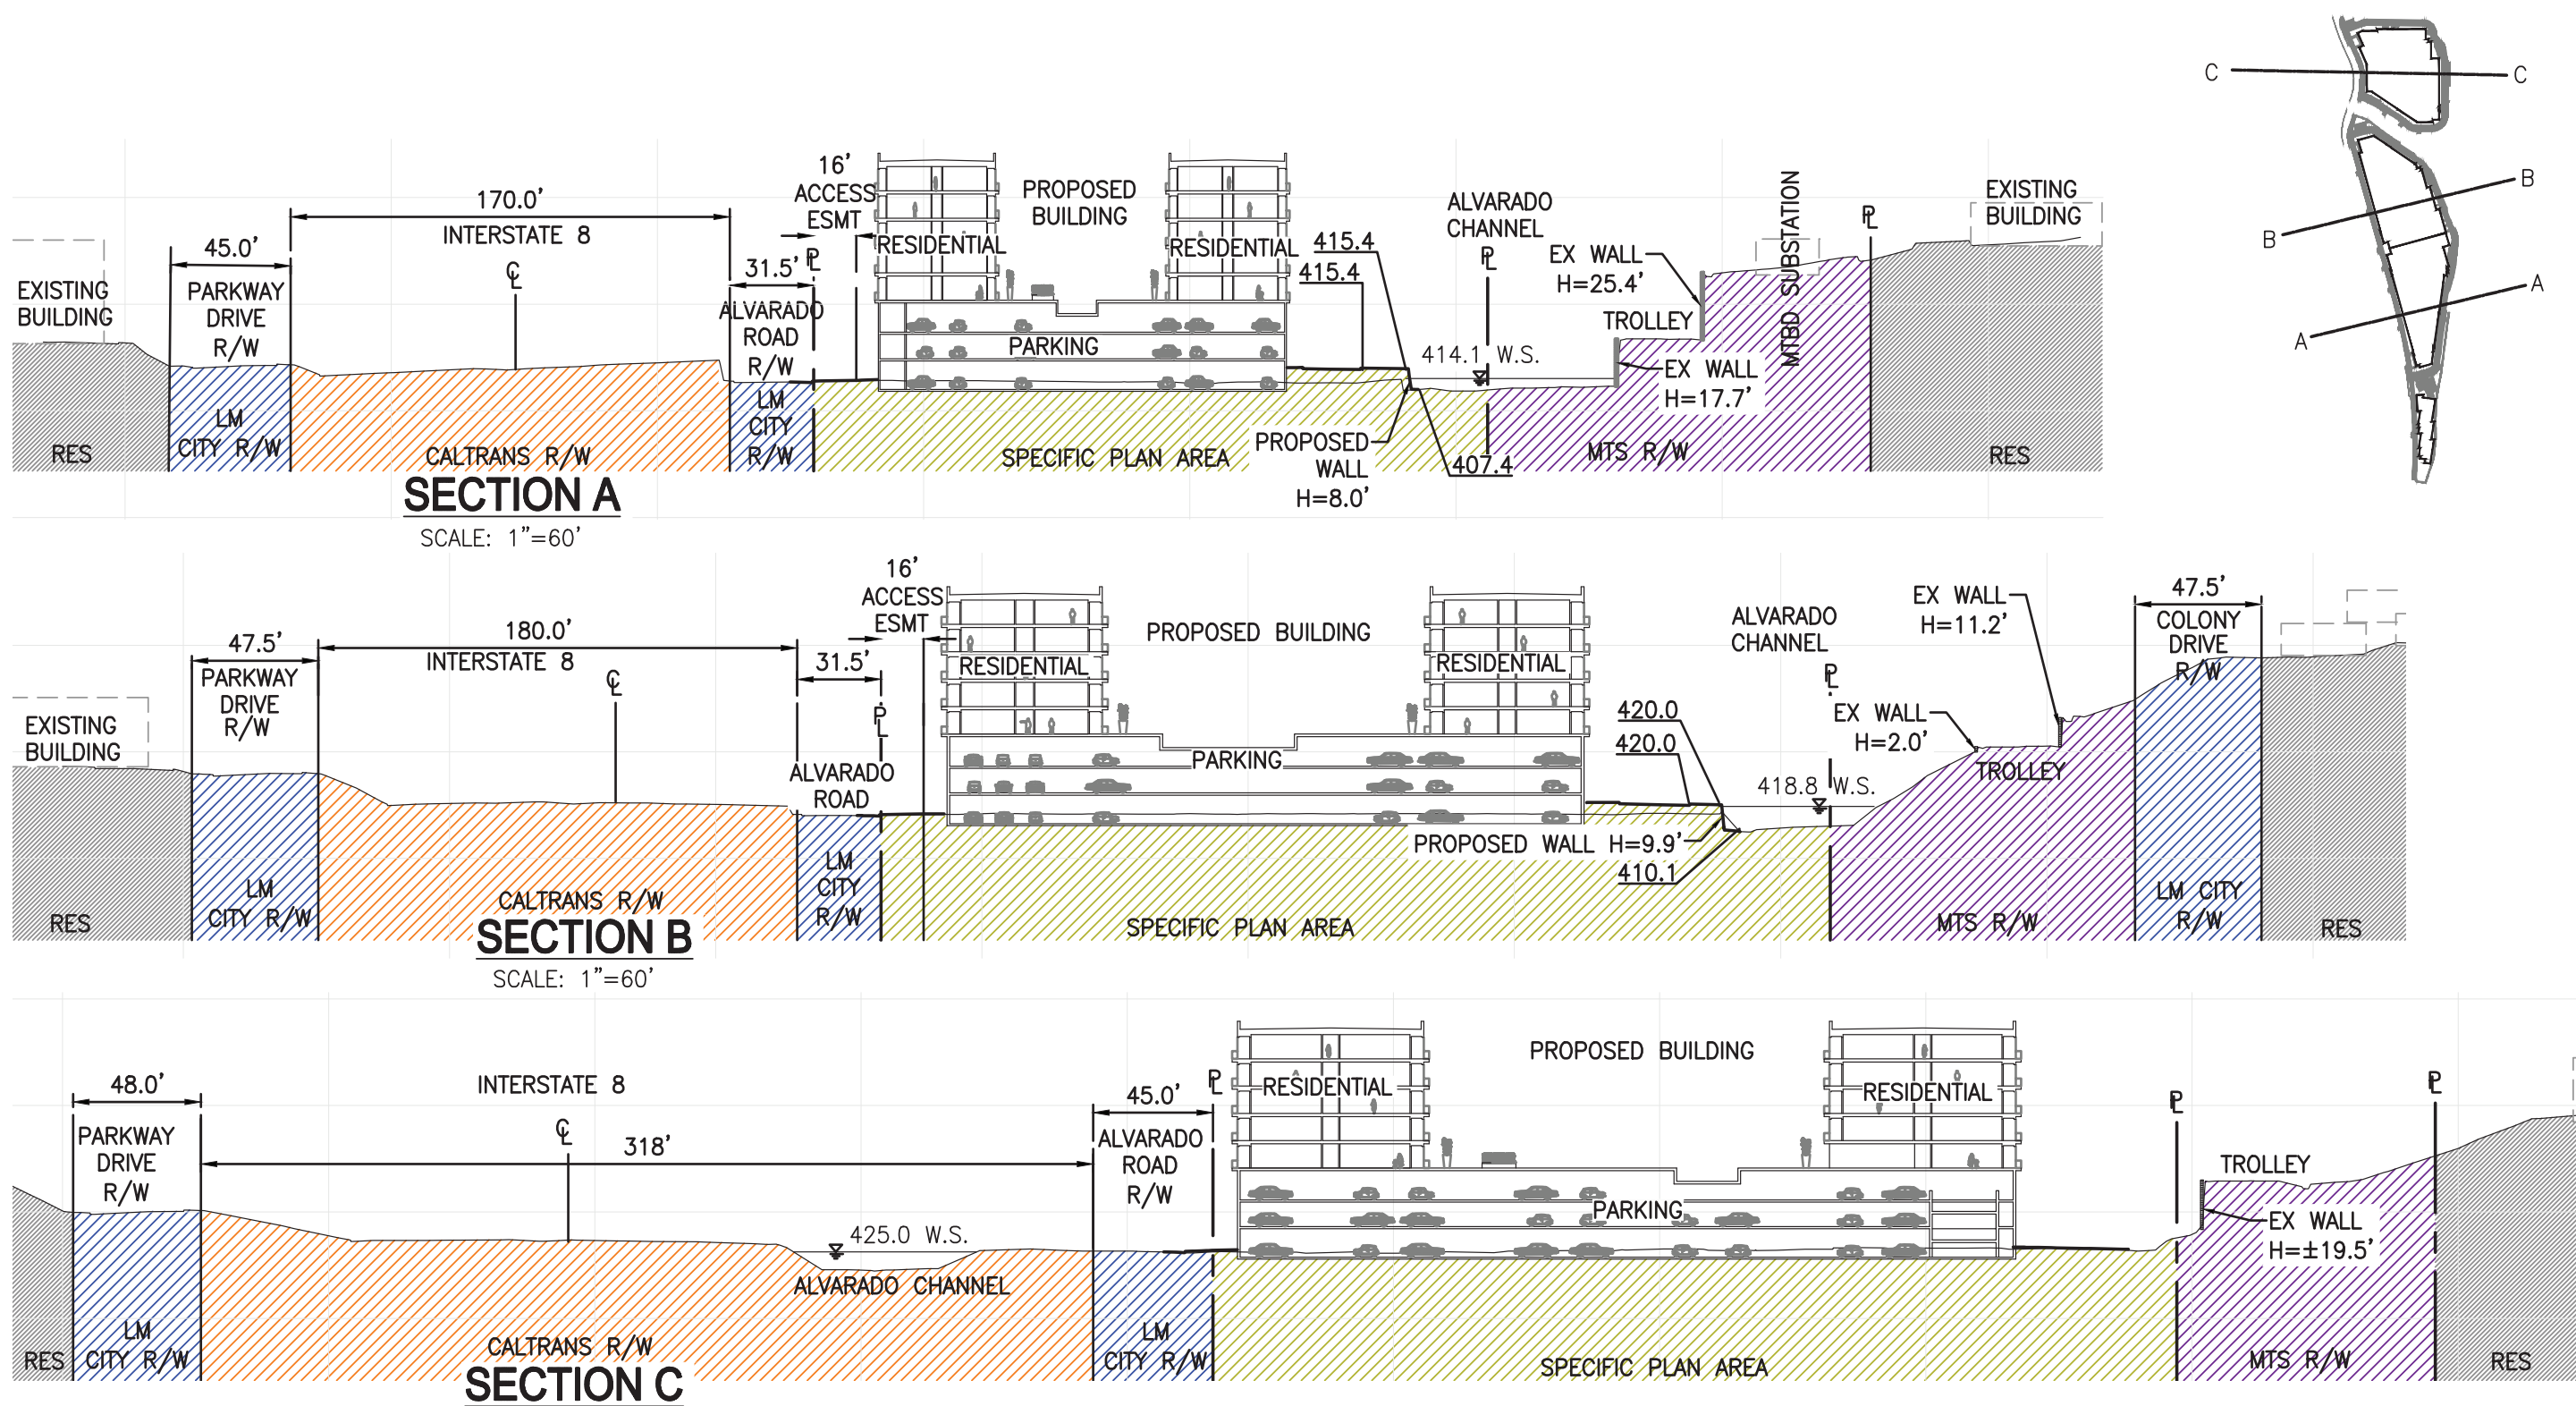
Site North/South Sections, MTS Trolley Line to Parkway Drive
